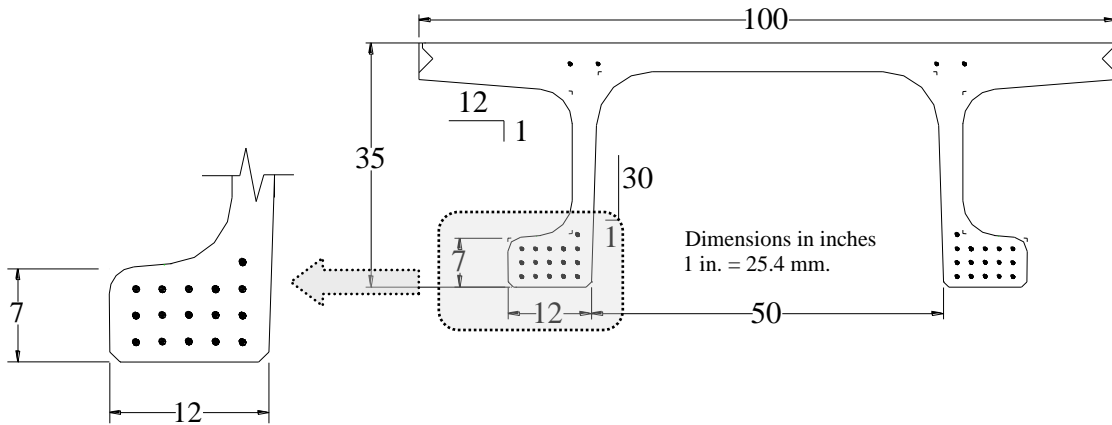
Strand layout of 35-inch-deep section for 80-foot (24.4m) span
